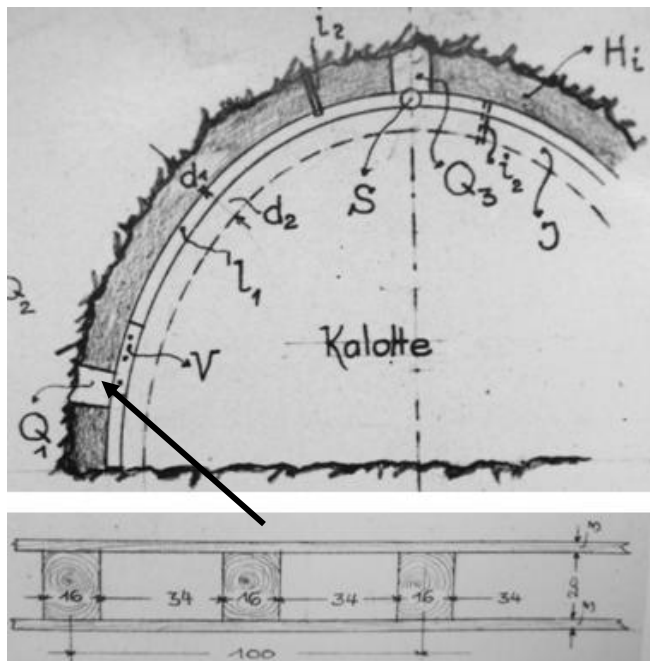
Concrete support with integrated timber element, as proposed by Rabcewicz [3]
